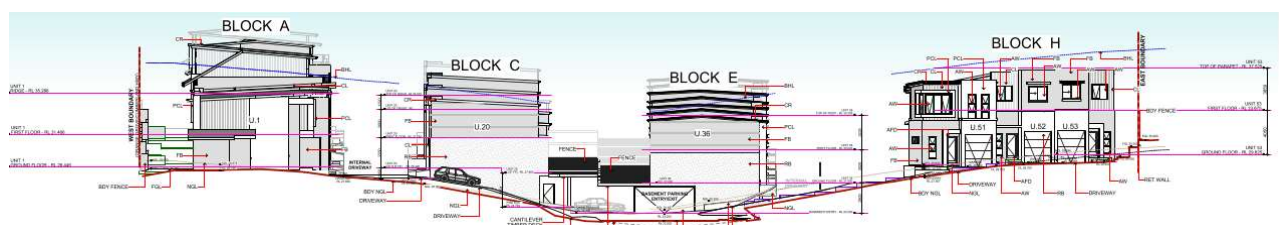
Proposed South Elevation facing the south adjoining neighbours who front onto Links Avenue.
